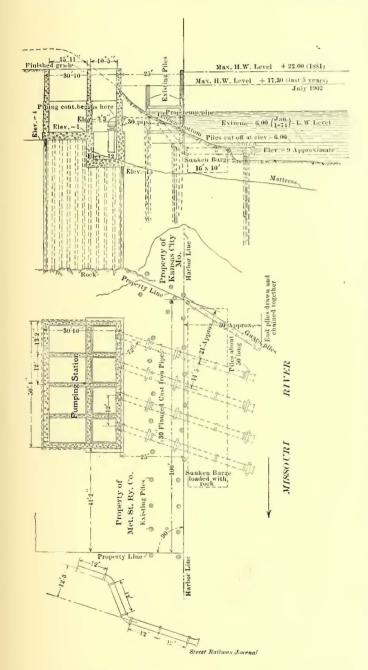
CIRCULATING WATER PLANT, SHOWING LOCATION
